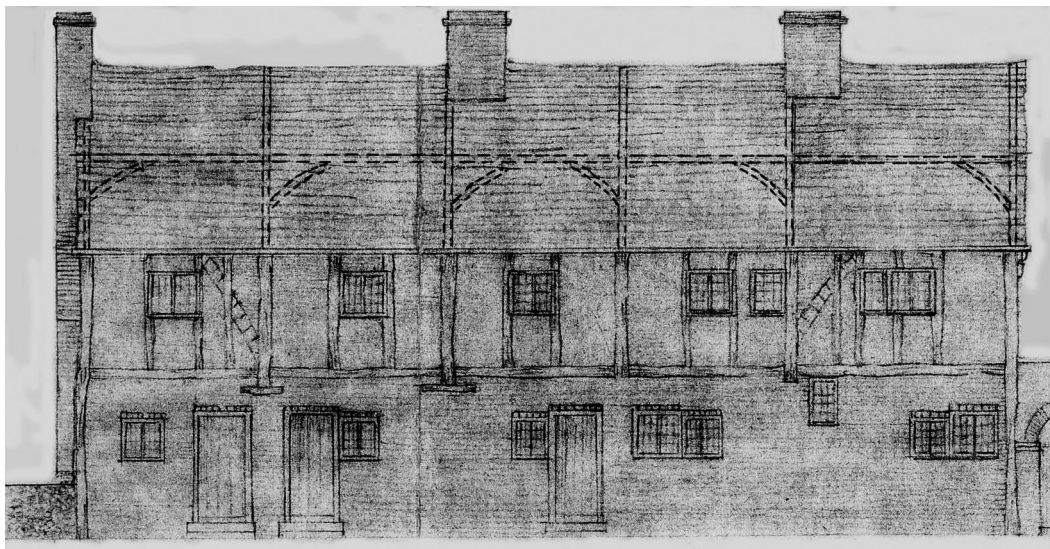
Architects drawing (1949) showing the north elevation with wind-bracing under the tiles added (shown dotted)
